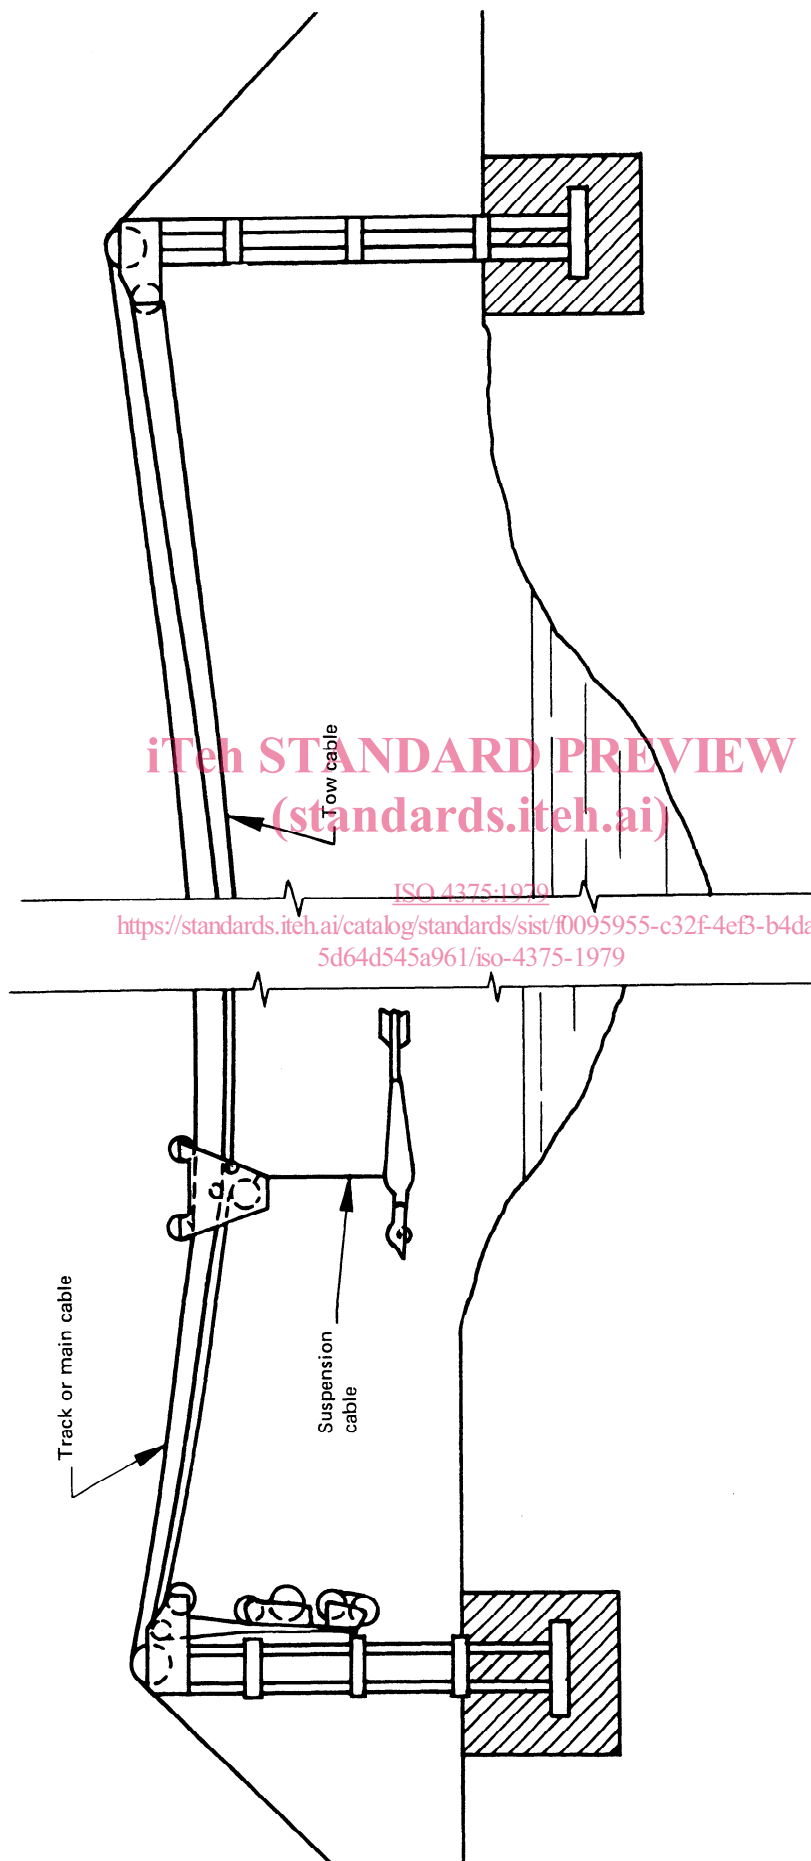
Cableway system — Unmanned instrument carriage, with tow cable and suspension cable in an endless circuit
